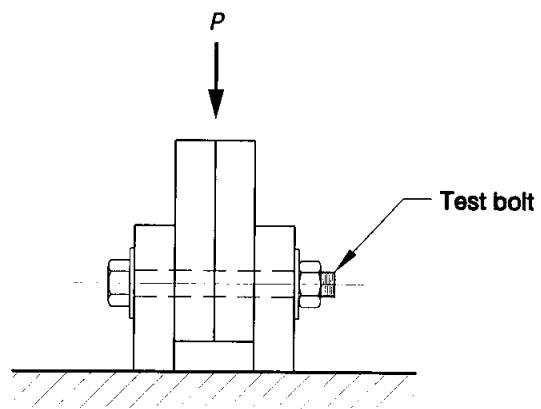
Compression jig for testing a single bolt in shear.
